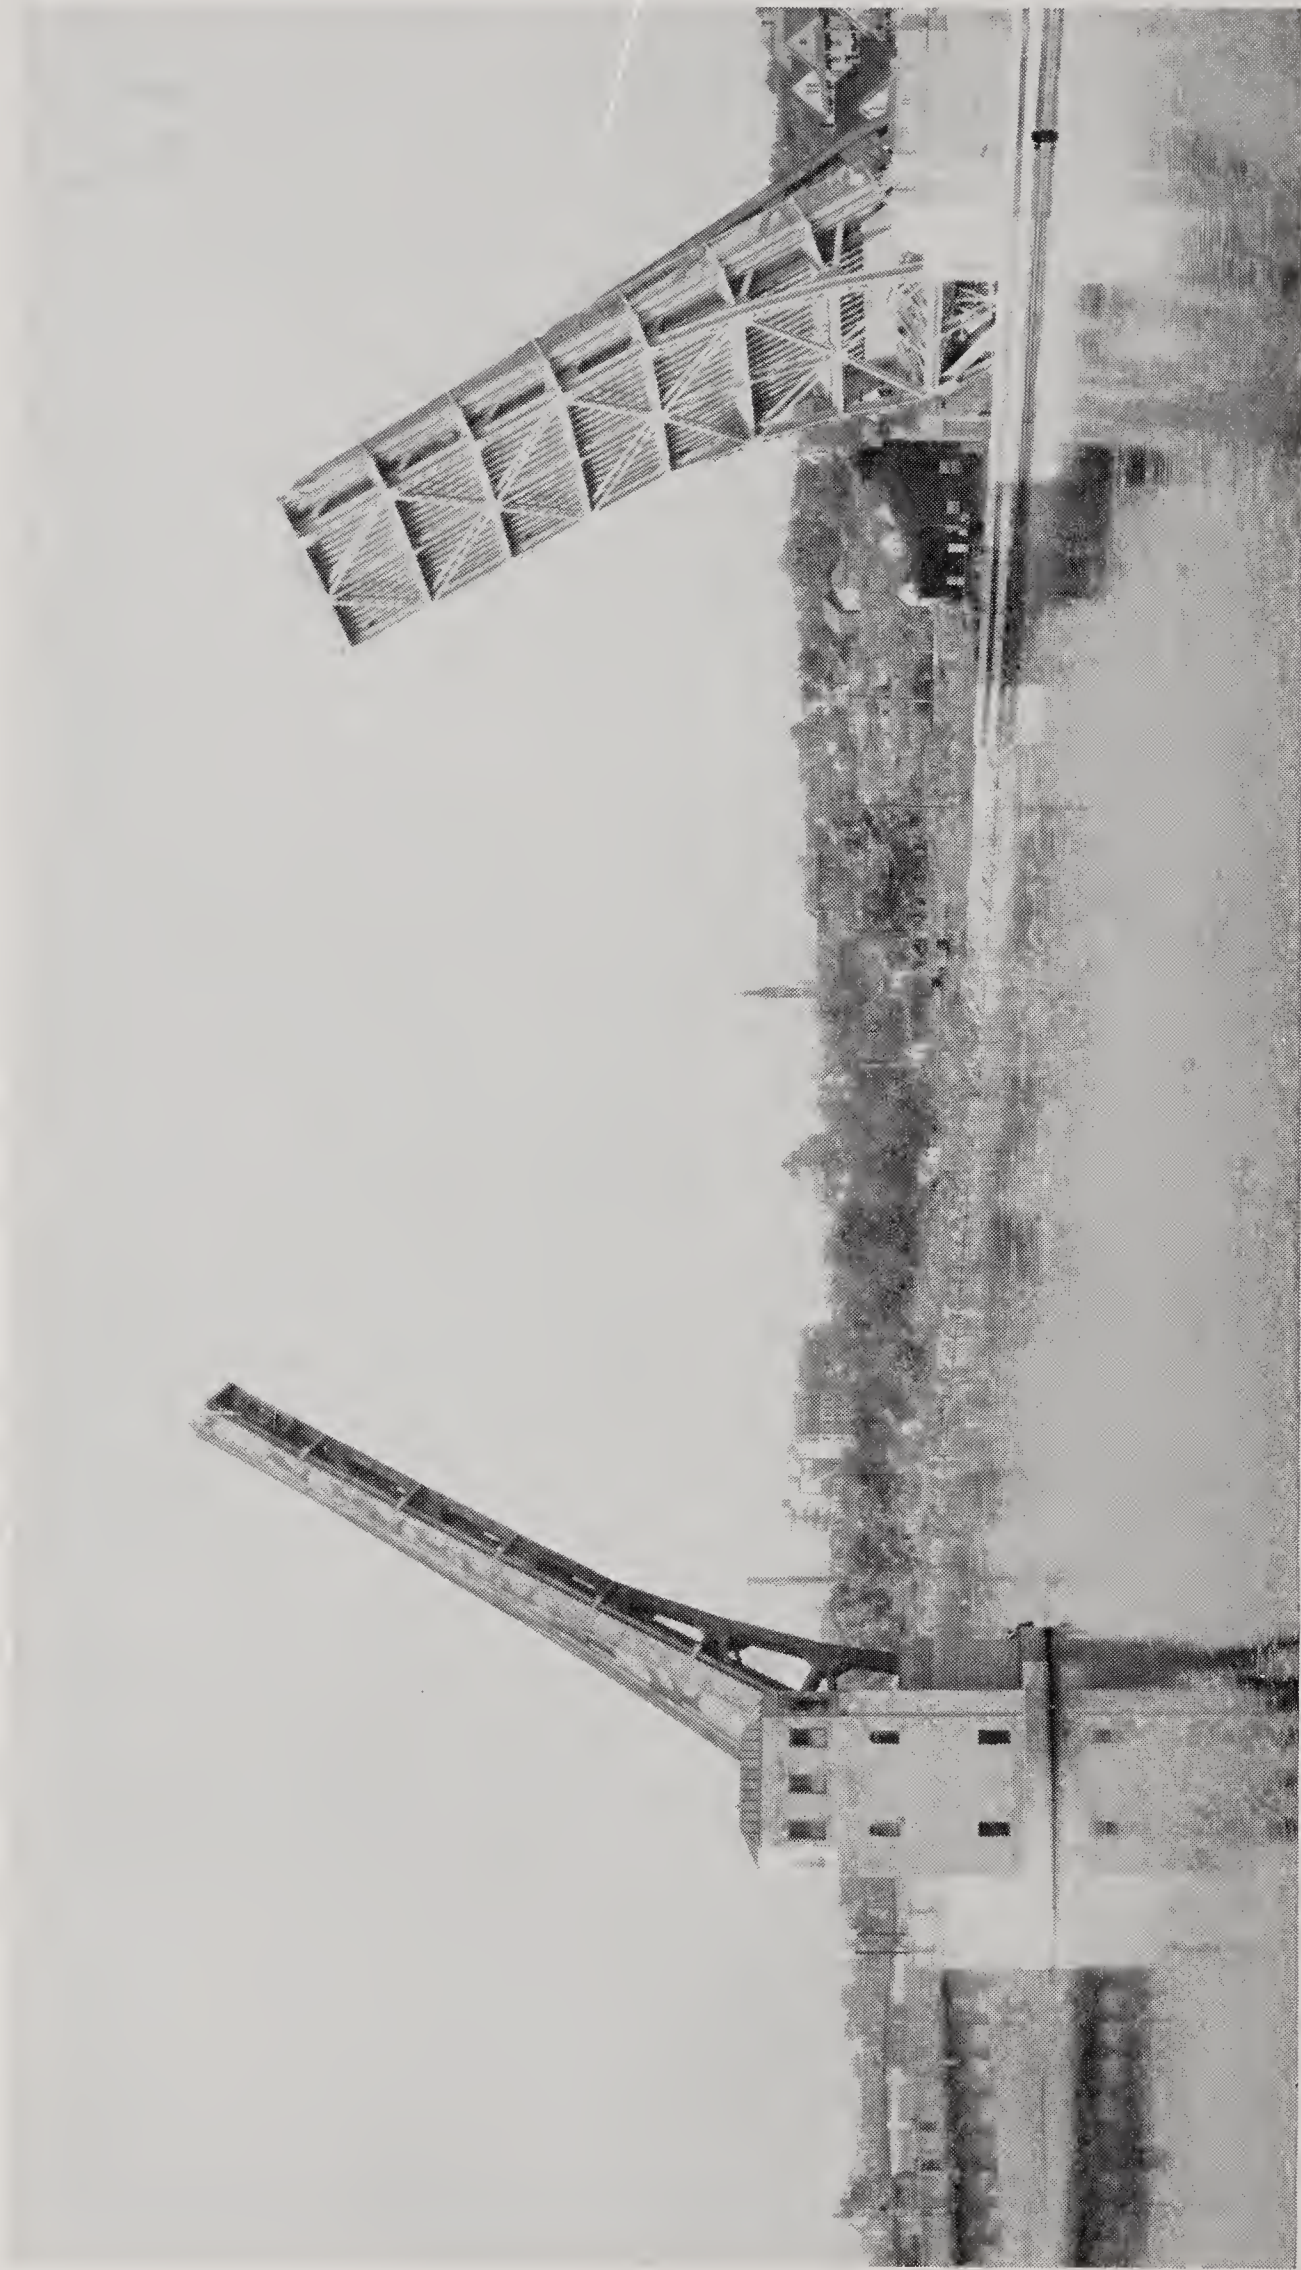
Ruby Street Bridge, Joliet. Side view, bridge open ; looking south.
